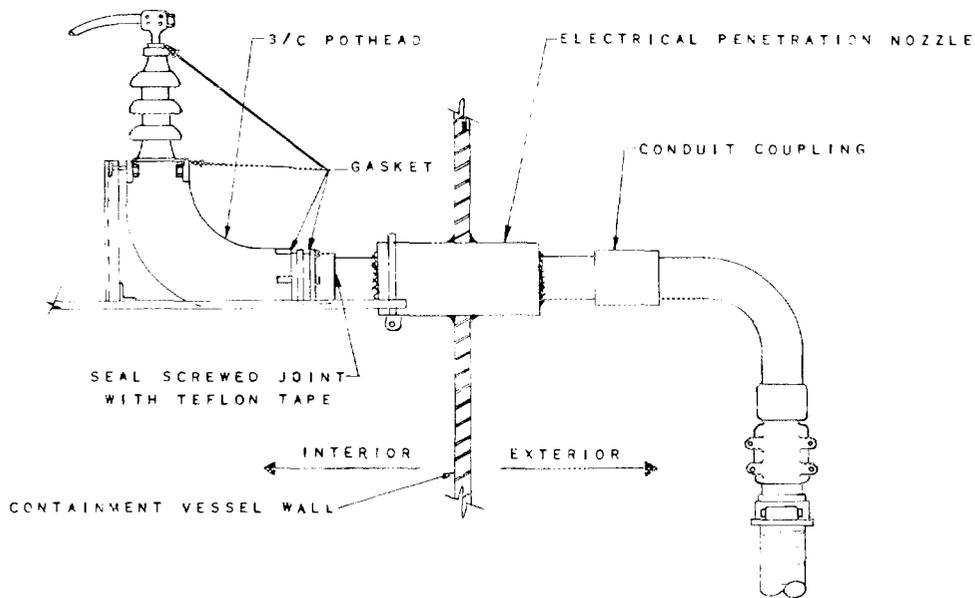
Gasketed Cable Penetration Used at Peach Bottom. (From ref. 6)
